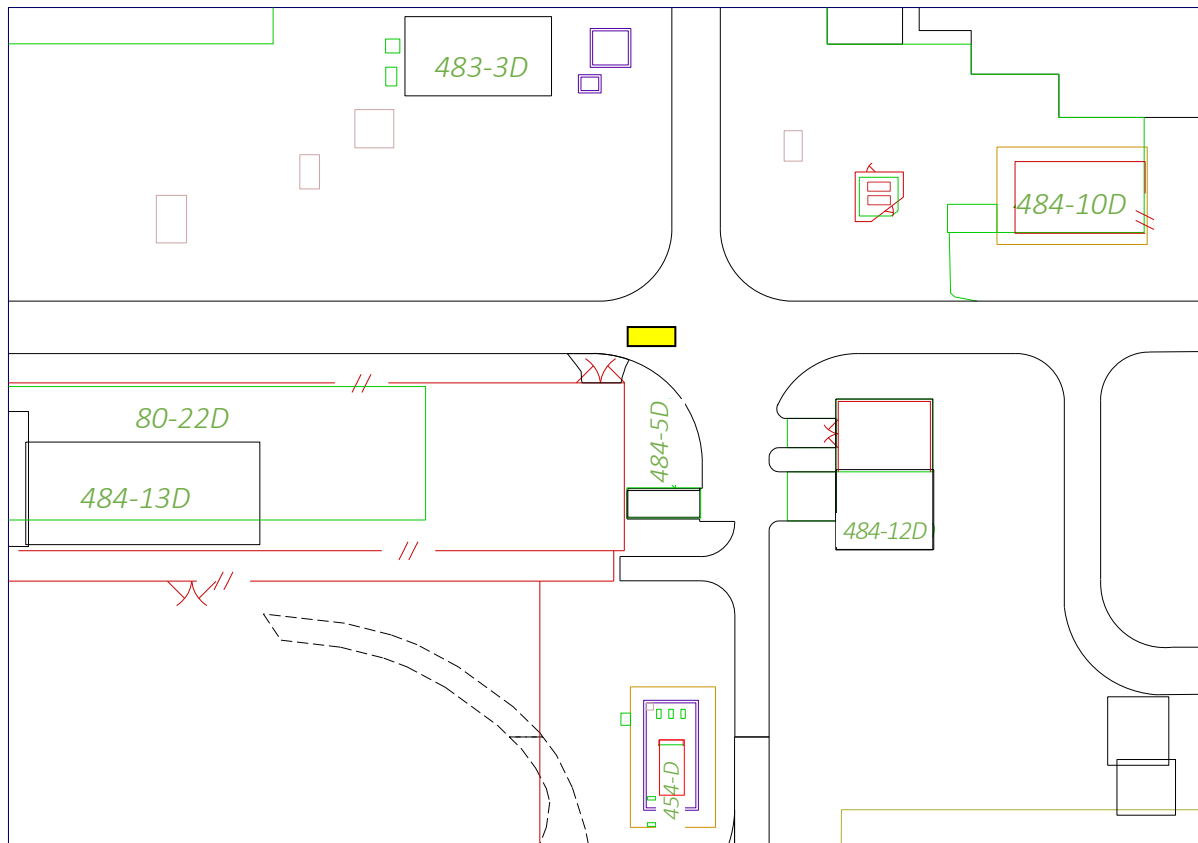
Building 484-5D, Storage Building Area (Layout/Location)
